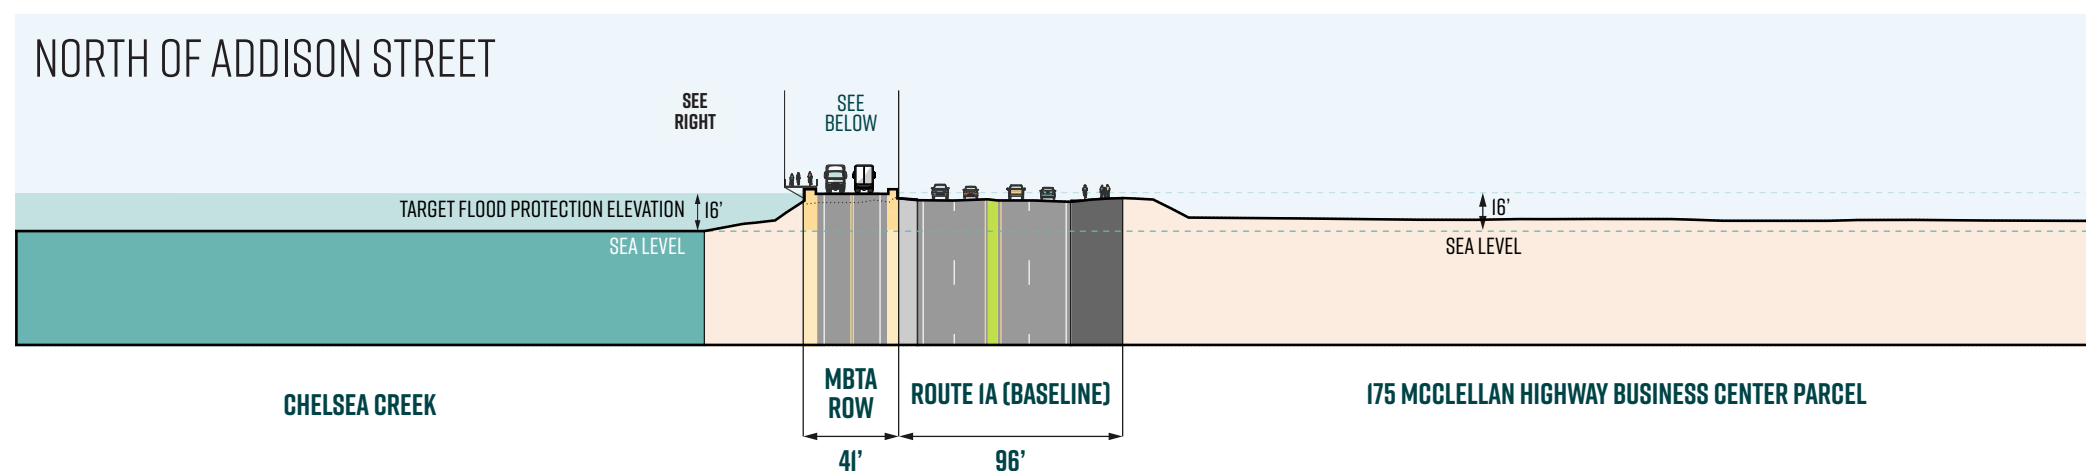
Bypass Road with Shared Use Path (SUP) – Addison Street to Boardman Street
